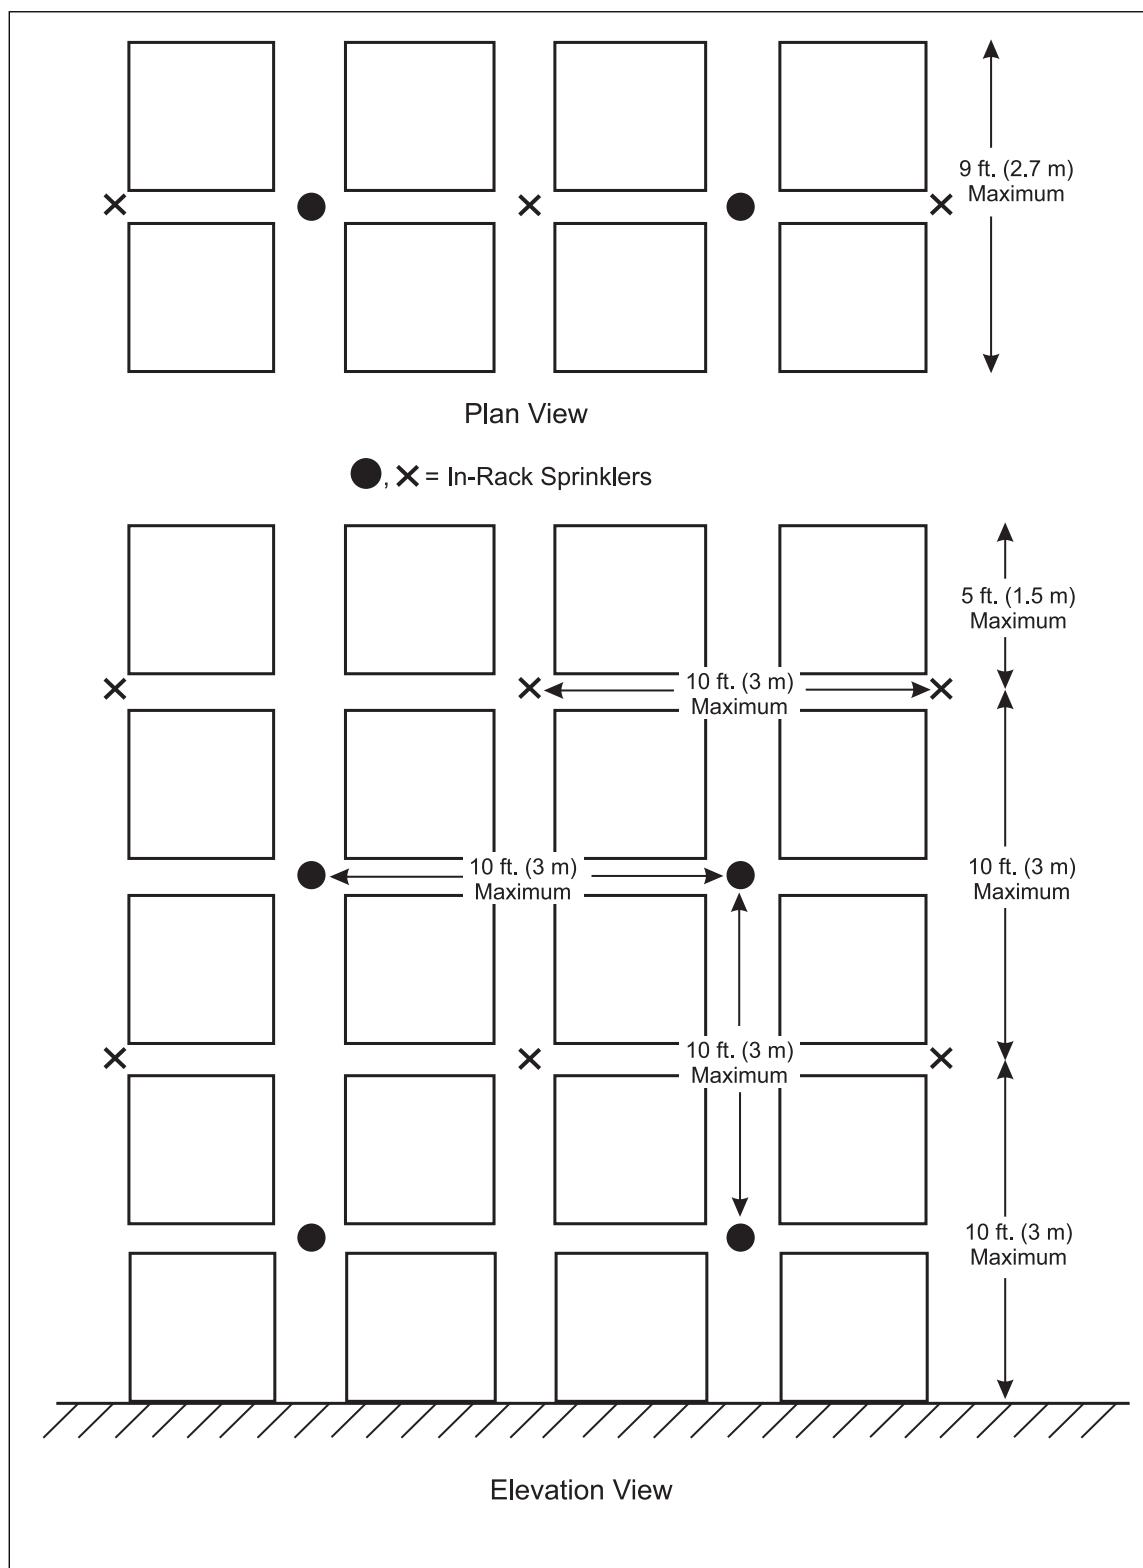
Double-row rack sprinkler layout: quick response sprinklers protection scheme
